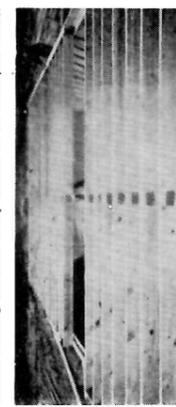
In-line floor joist joints spliced over a central beam in a UNICOM house.
